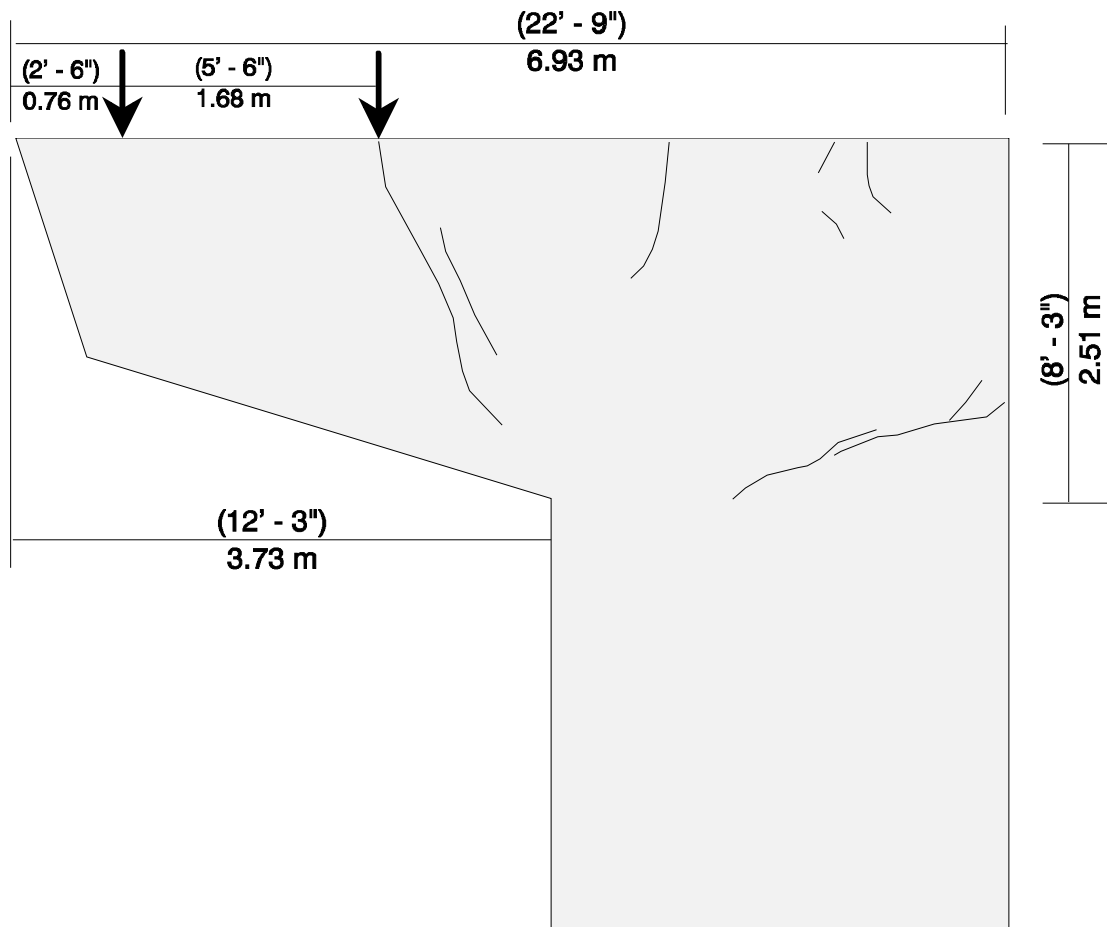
Pattern of Cracks in Pier I-5C
